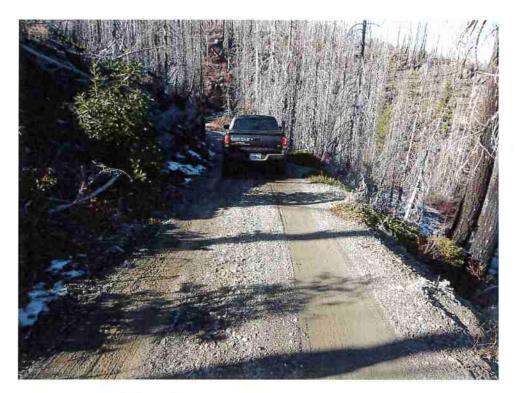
RP 15. Vehicle traveling north-west, photo taken facing north-west.
